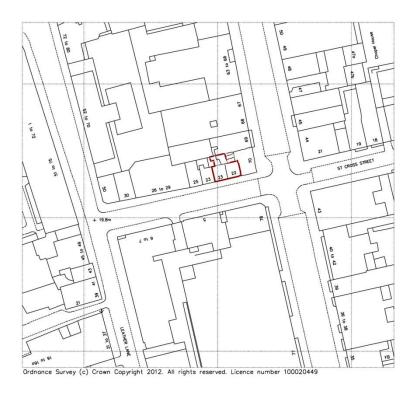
Site Location Plan (Not to scale). Site Boundary shown with red line.
